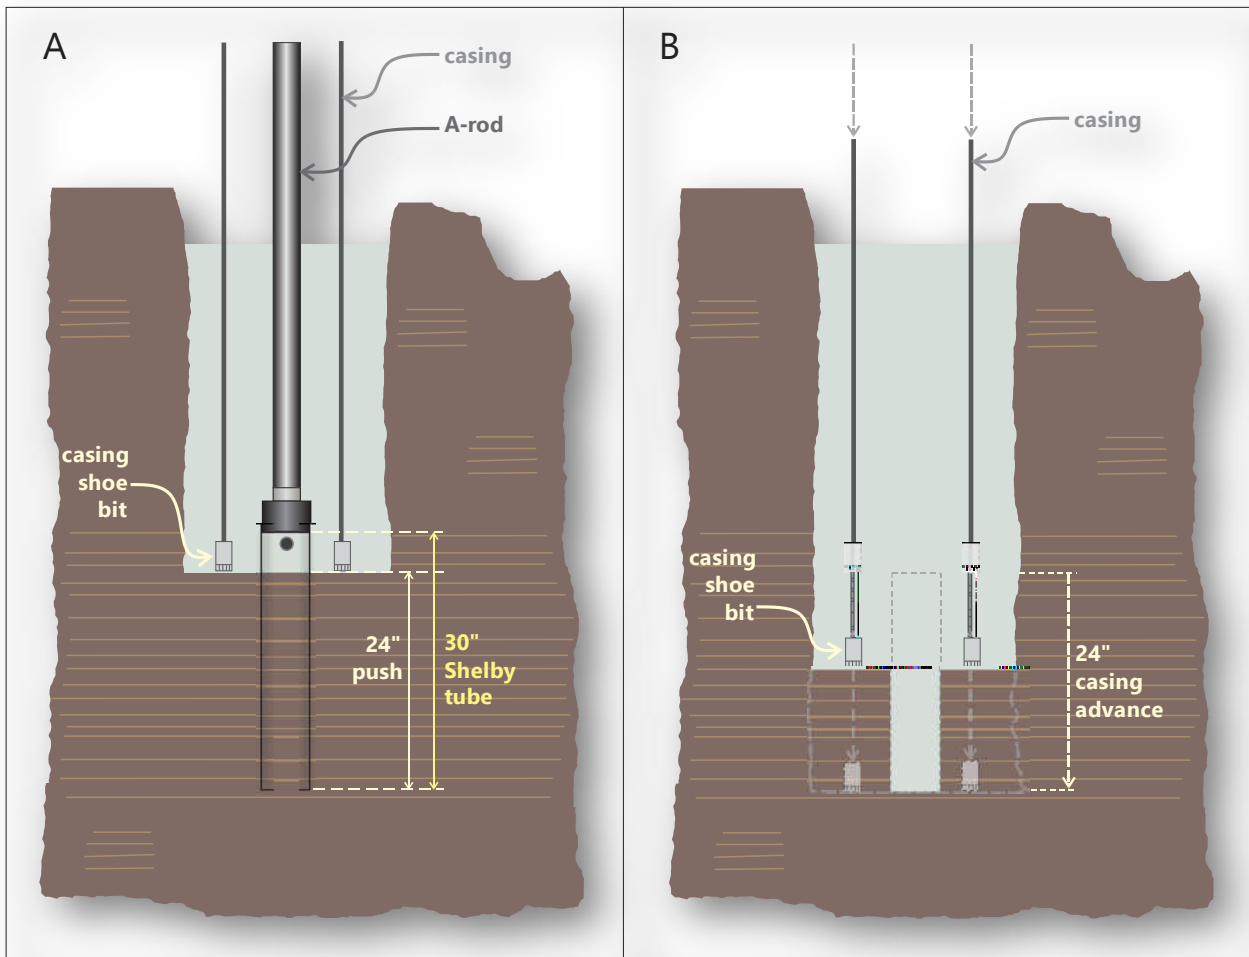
A) Schematic of coring below the casing with an open tube sampler; B) Advancing the casing prior to coring the next depth
